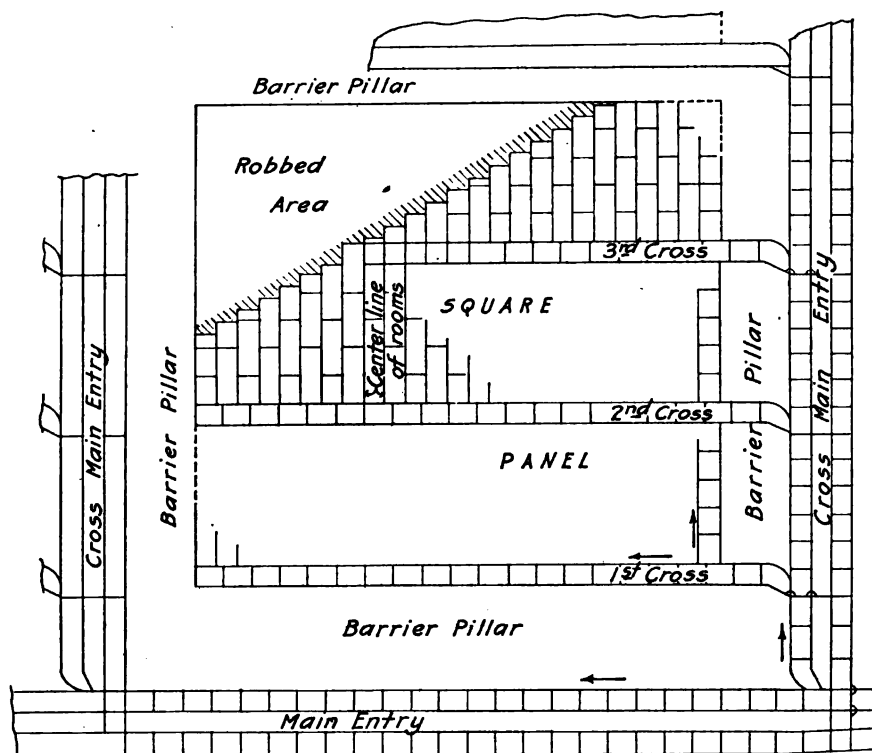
TYPICAL PLAN OF MINING ON THE PANEL SYSTEM.
